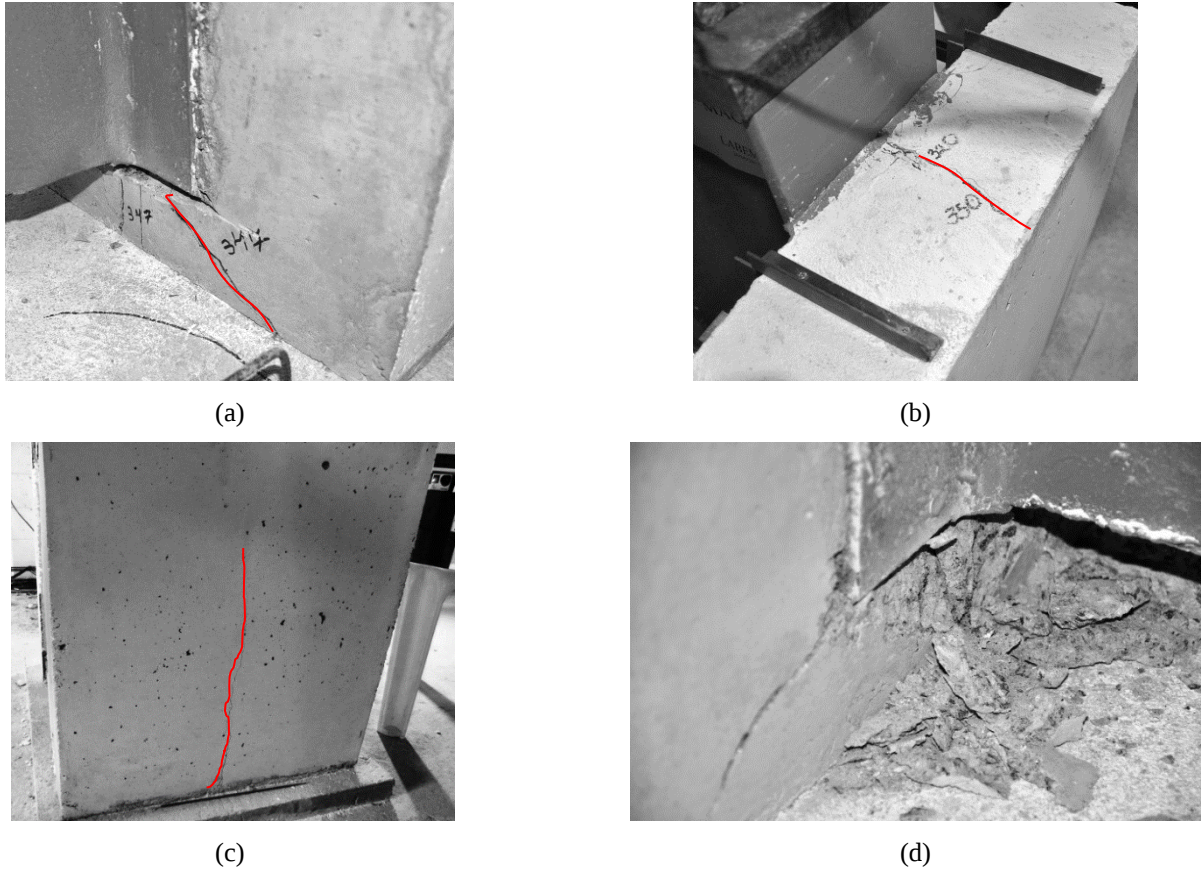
Failure surfaces – MAC specimens. (a) and (b) failure at the concrete block – crack orientation on the cross section; (c) longitudinal crack; (d) crushing of the concrete.
